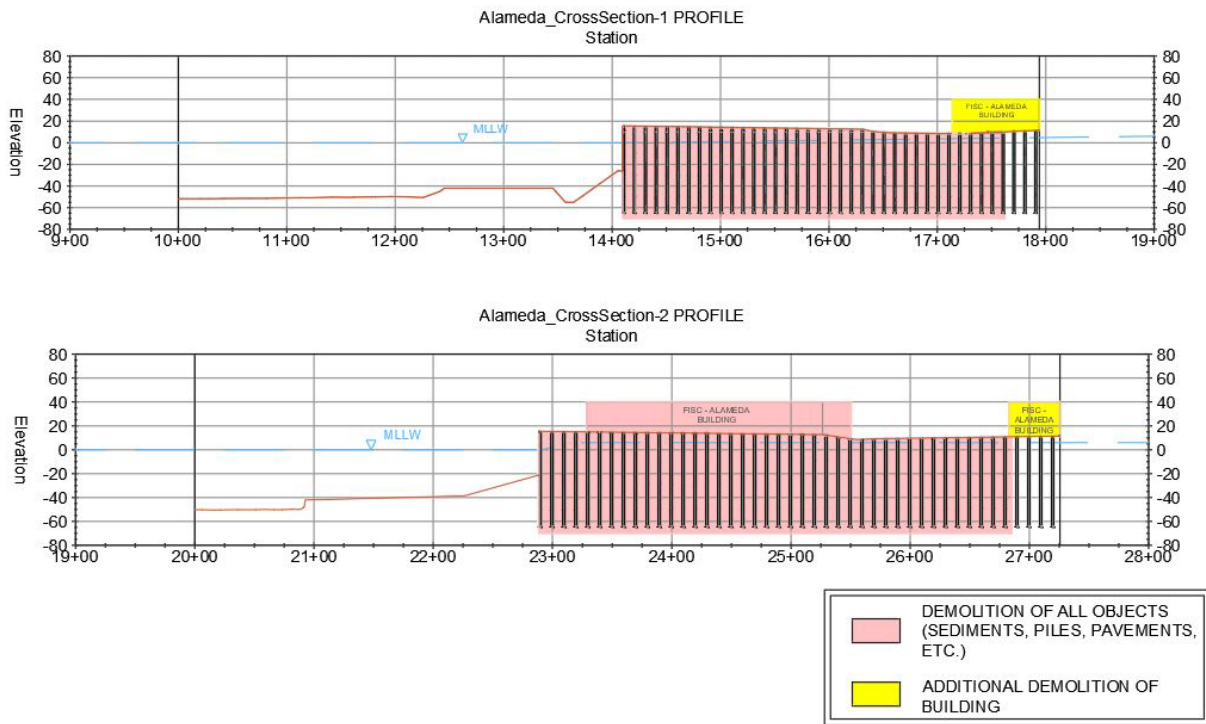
Alameda Wharf Demolition, Cross Sections with (E) bulkhead elevations
